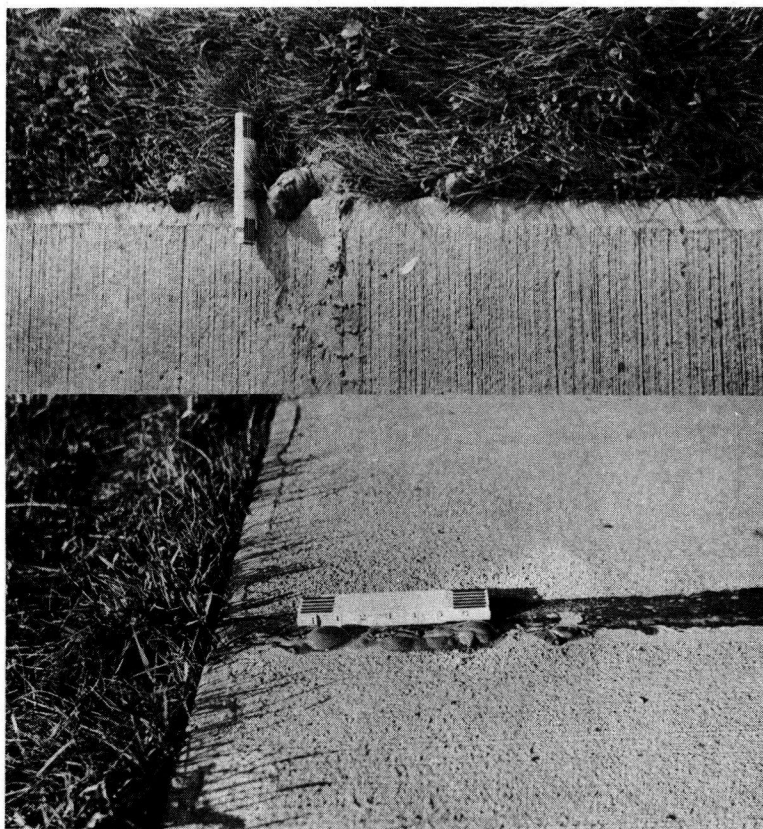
Mud boils have been pumped onto pavement at the outer edge of the slabs and at the joints in sections having plain concrete, 15-foot joint spacing and no subbase (type I pumping). At top is Station 317+79; bottom, Station 454+37.
